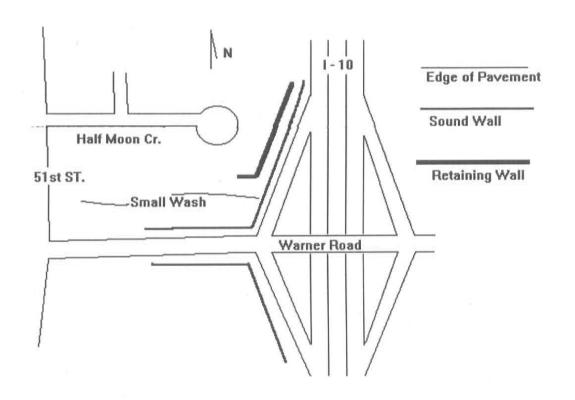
Location of the Warner Road I.C. Retaining Wall.
